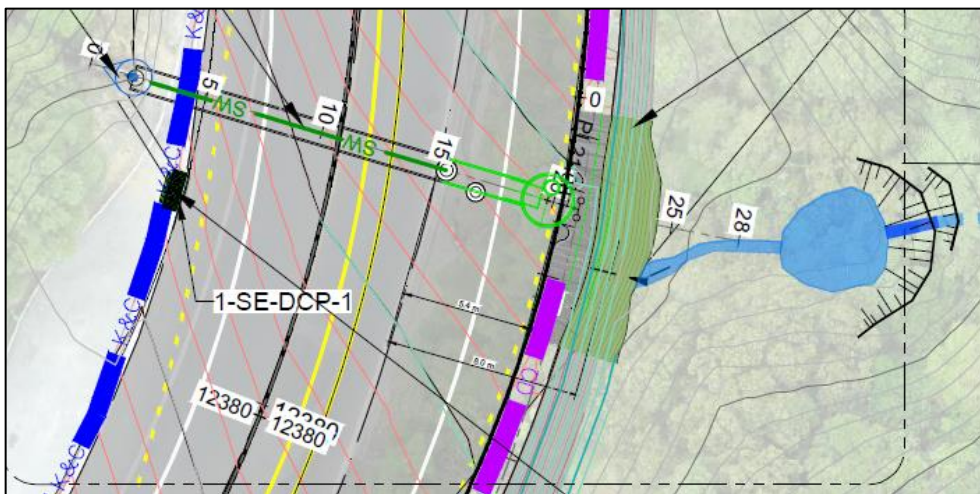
Site D2 existing culvert shown in black and new extension and manhole in green.
